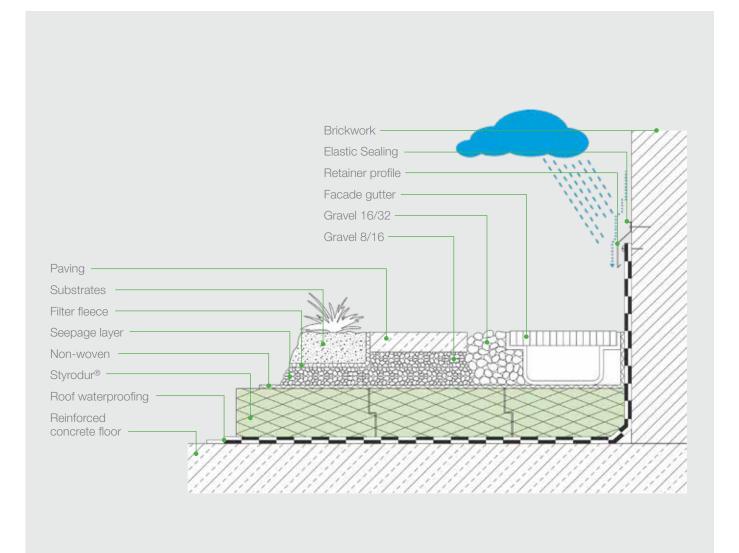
Inverted green roof connection to a rising wall with facade gutter.
